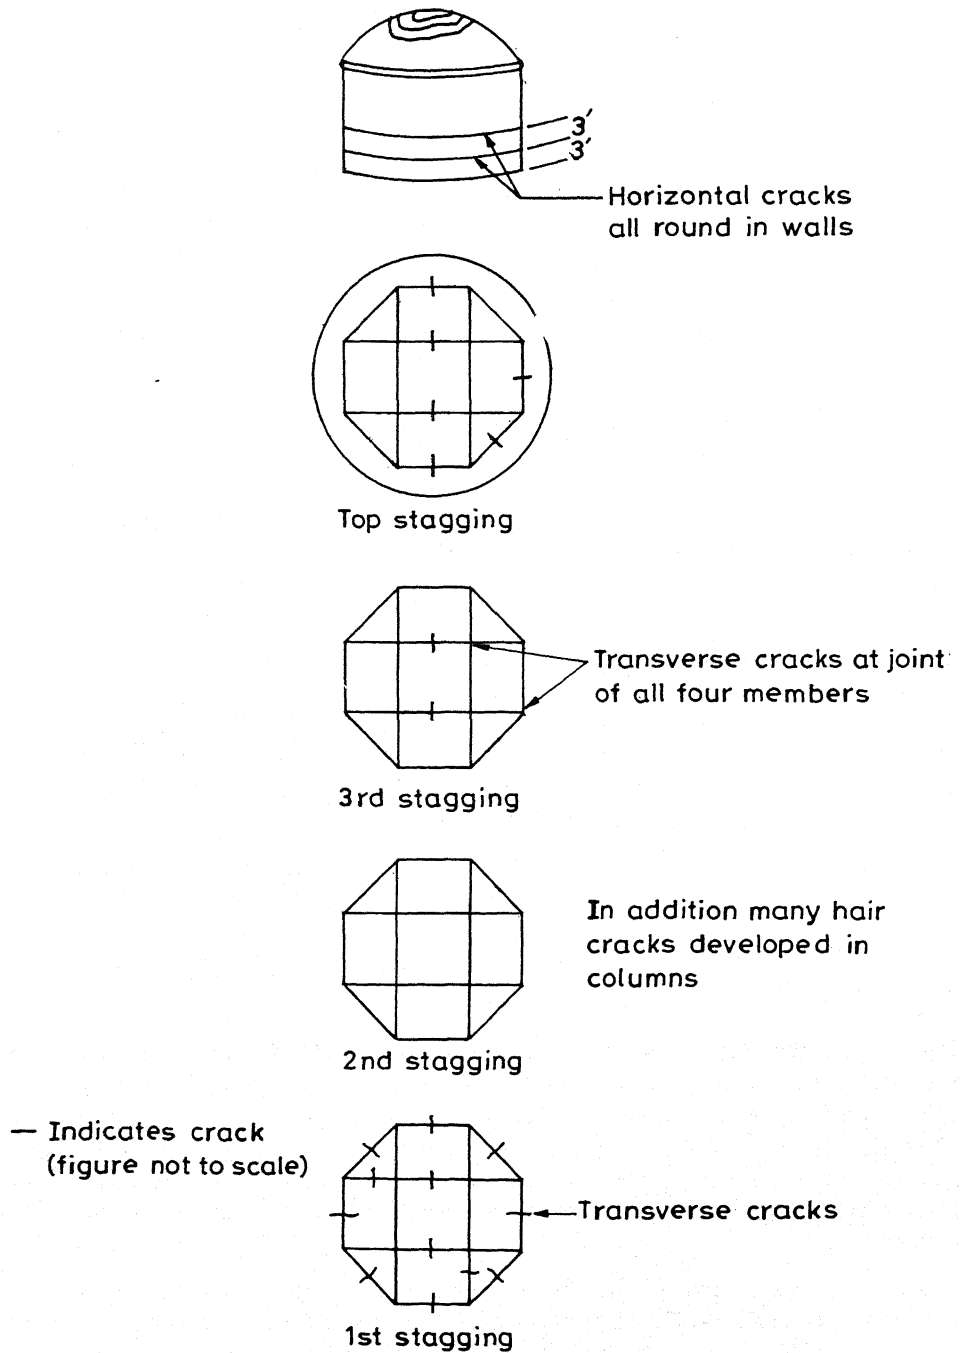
Details of damage to the tank at Khagaria (as per PHE Dept., Govt. of Bihar).
